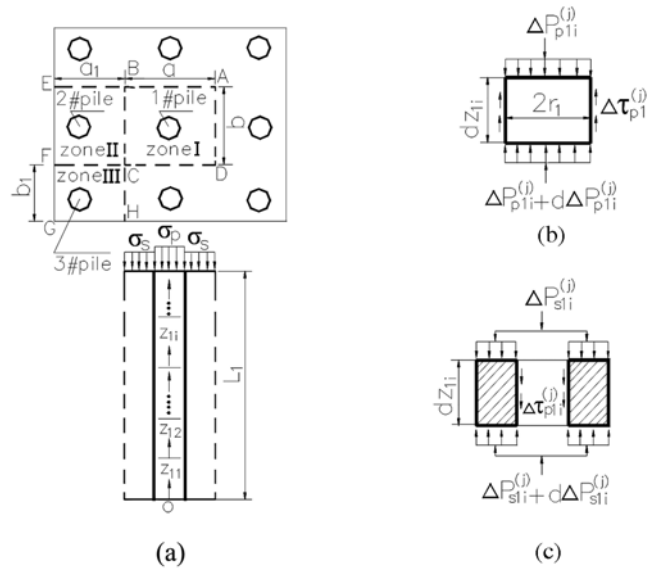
(a) System of the pile-soil, (b)(c) Stresses acting on element of pile and soil, respectively
